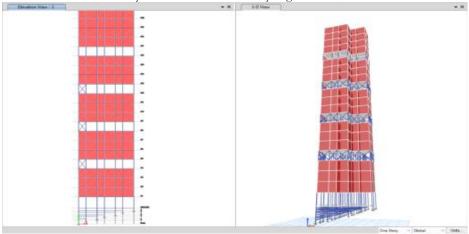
Elevation & 3D view of the building with bracing at 4th+8th+12th floors on 15° sloping ground
